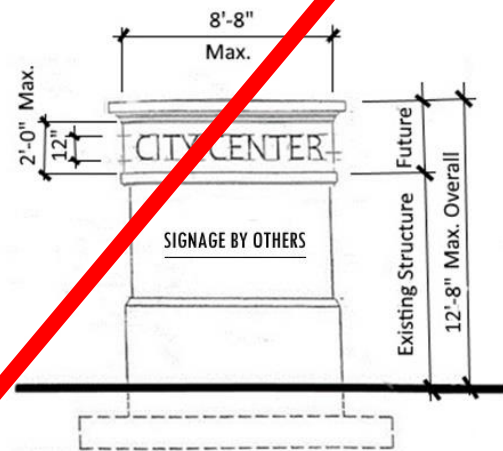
Monument Sign Type #1. Refer to construction drawings for dimensions of the existing sign structure. See file P19-231.
